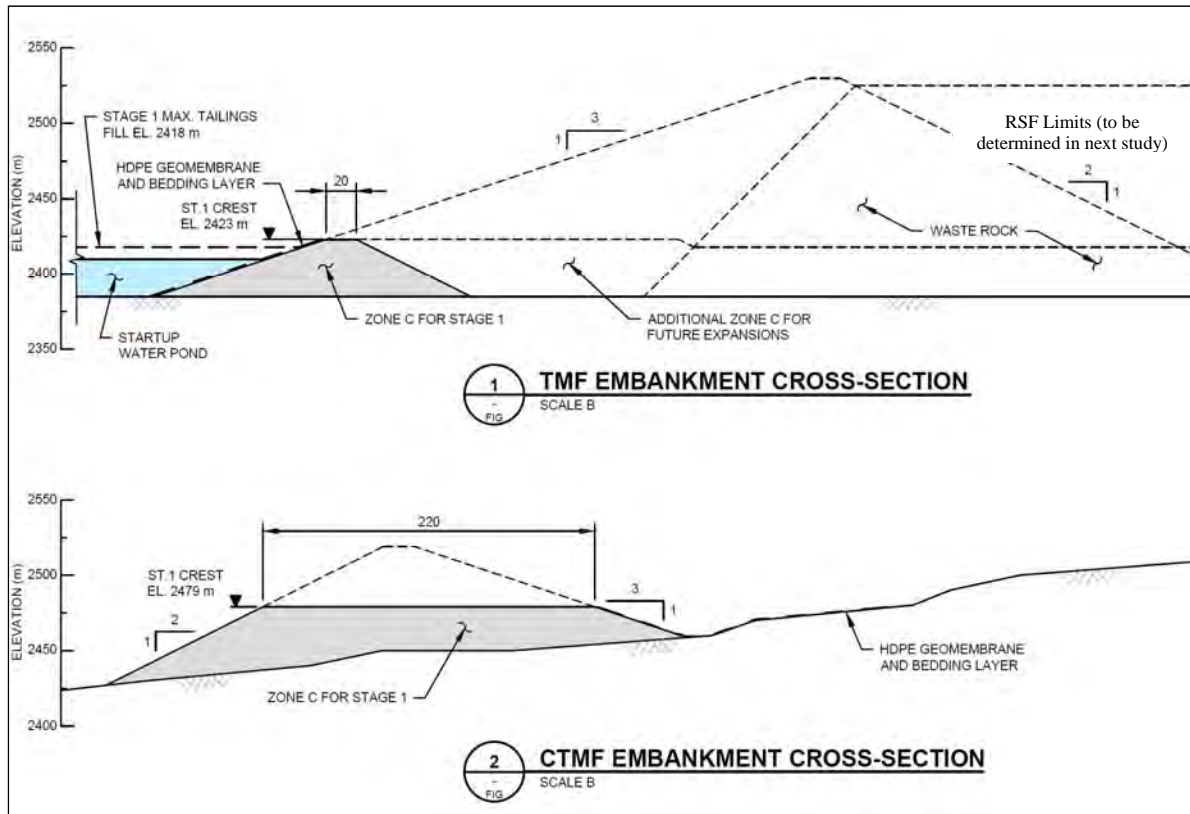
Stage 1 (Starter) Embankment Cross-section for TMF and CMTF (Base Case)
